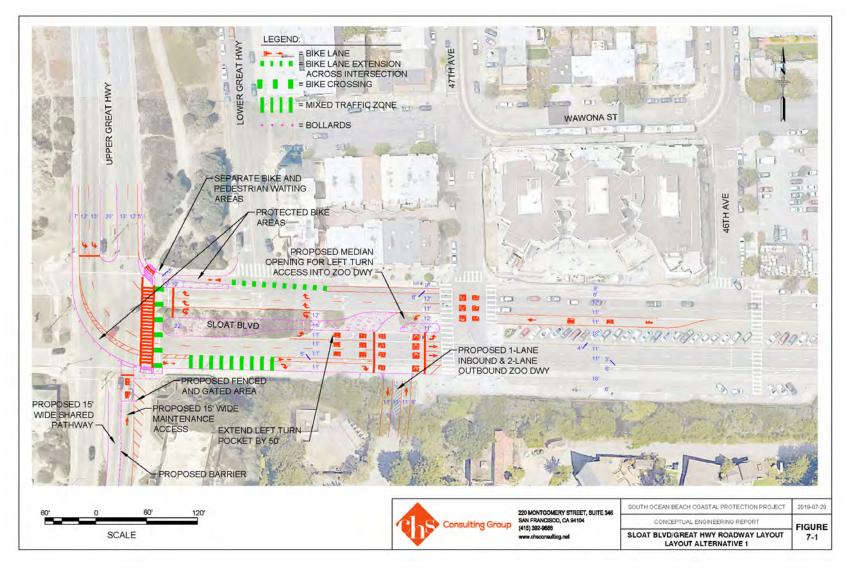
Great Highway at Sloat Boulevard Intersection – Alternative 1
